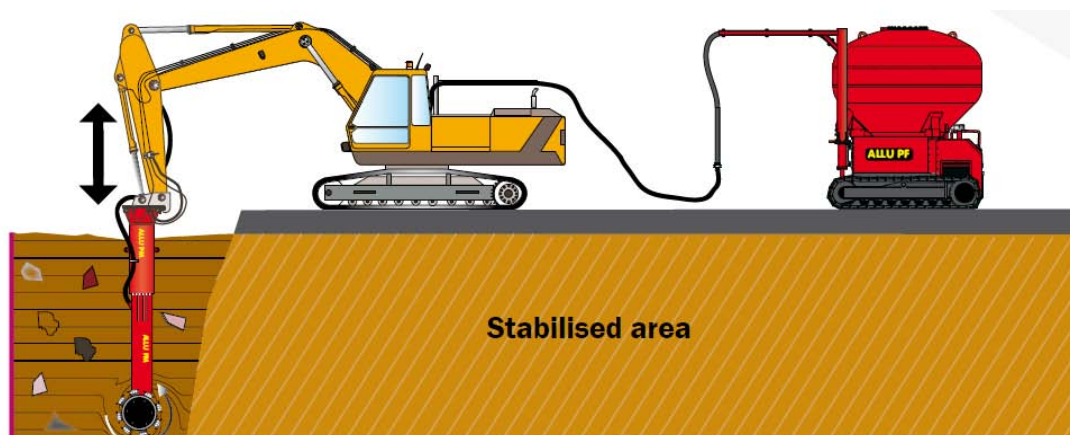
ALLU STABILISATION/SOLIDIFICATION TREATMENT SYSTEM
